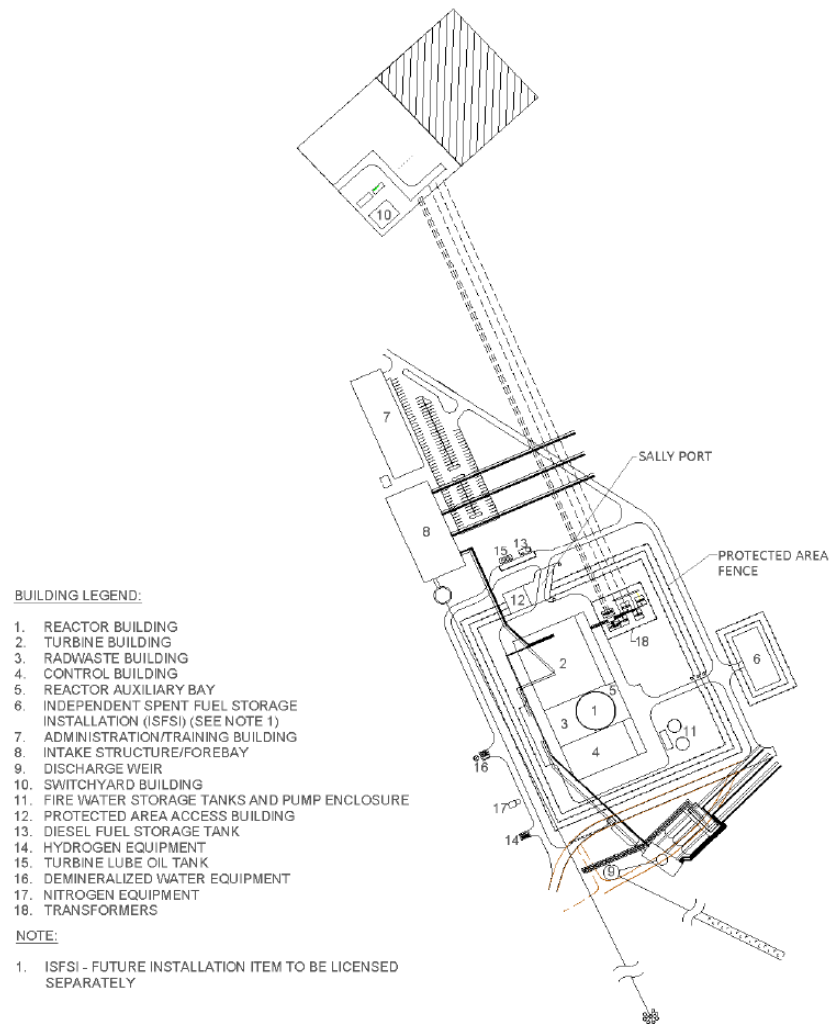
Detailed view of Preliminary Layout of Single BWRX 300 Unit
